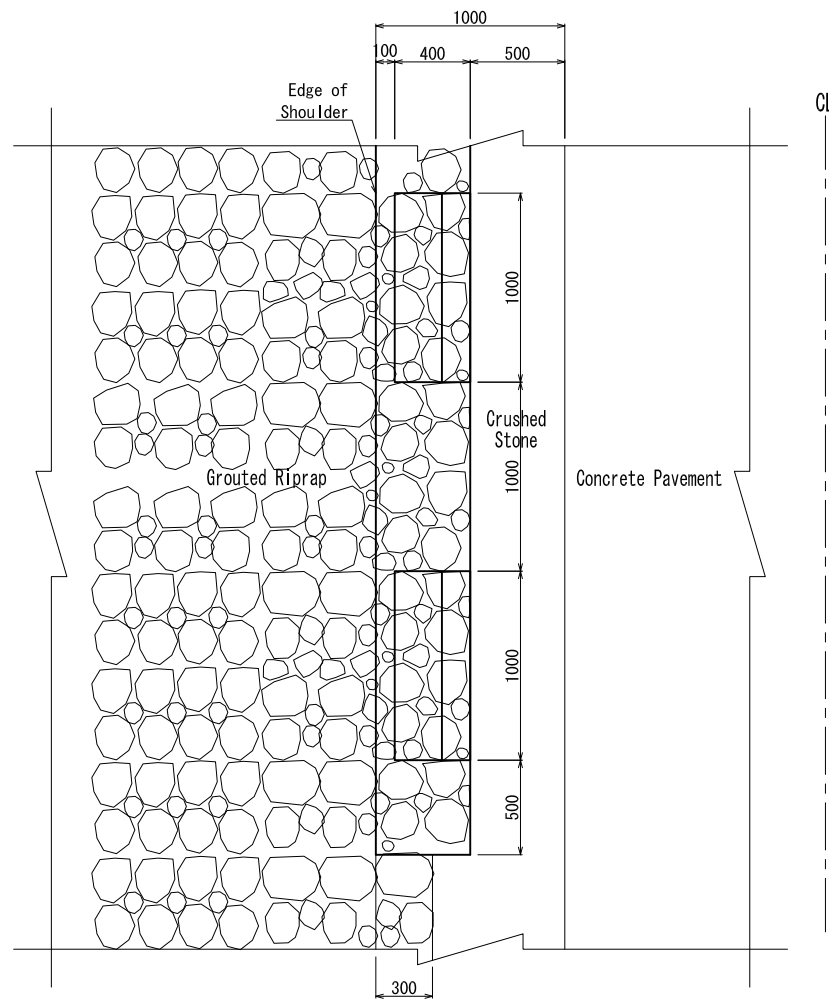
DETAIL OF EXISTING PCCP CONNECTION S=1:10
